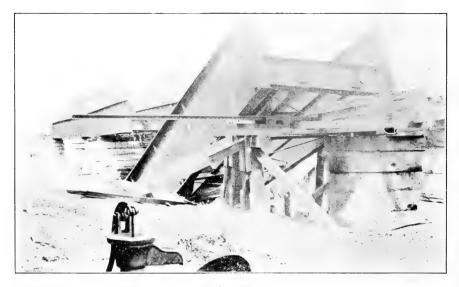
B. & O. Railroad bridge across White River, above Medora.
